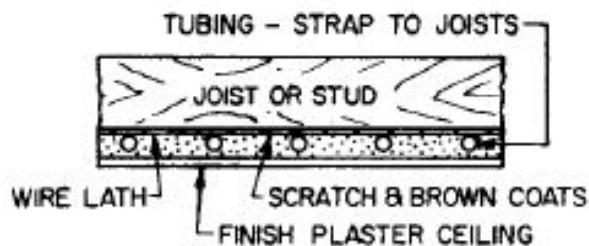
Pipe coil attached to joists or studs and embedded in plaster for radiant heating.
